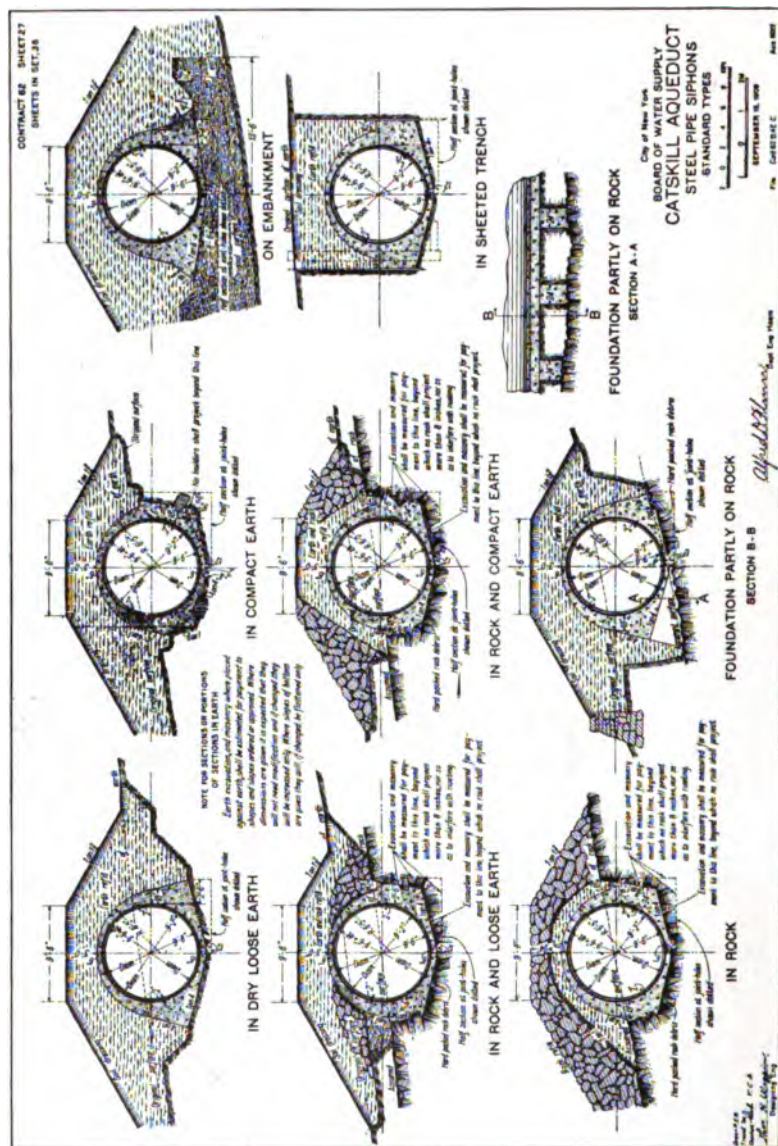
STANDARD TYPES OF TRENCH EMBANKMENT AND JACKET, SIMILAR FOR ALL SIZES OF PIPE.
